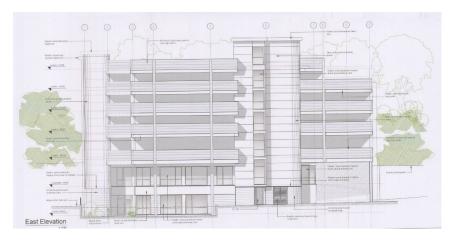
East elevation of 2014 approval for development on the former Greeba Works Site
